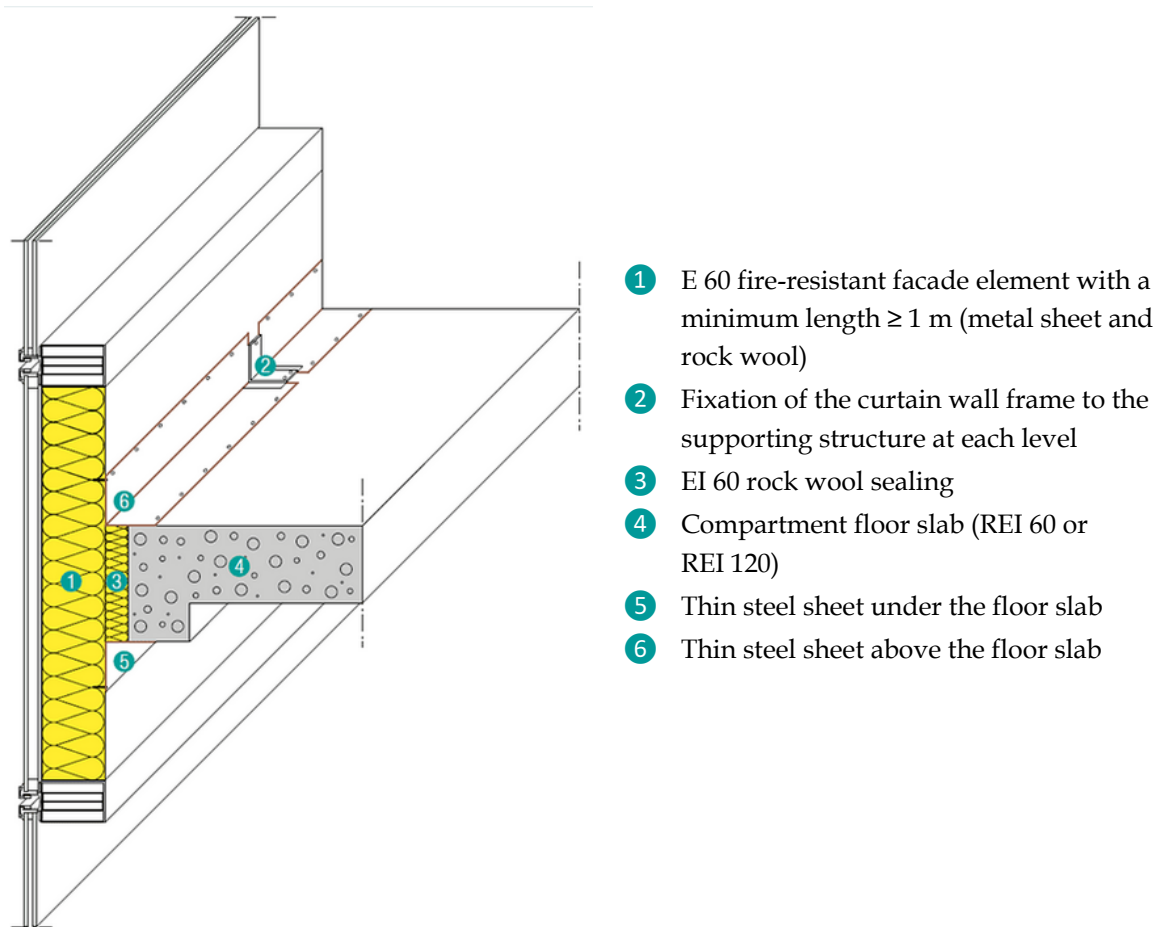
Example of an E 60 fire-resistant element and its junction with a concrete floor slab in the case of a curtain wall.
